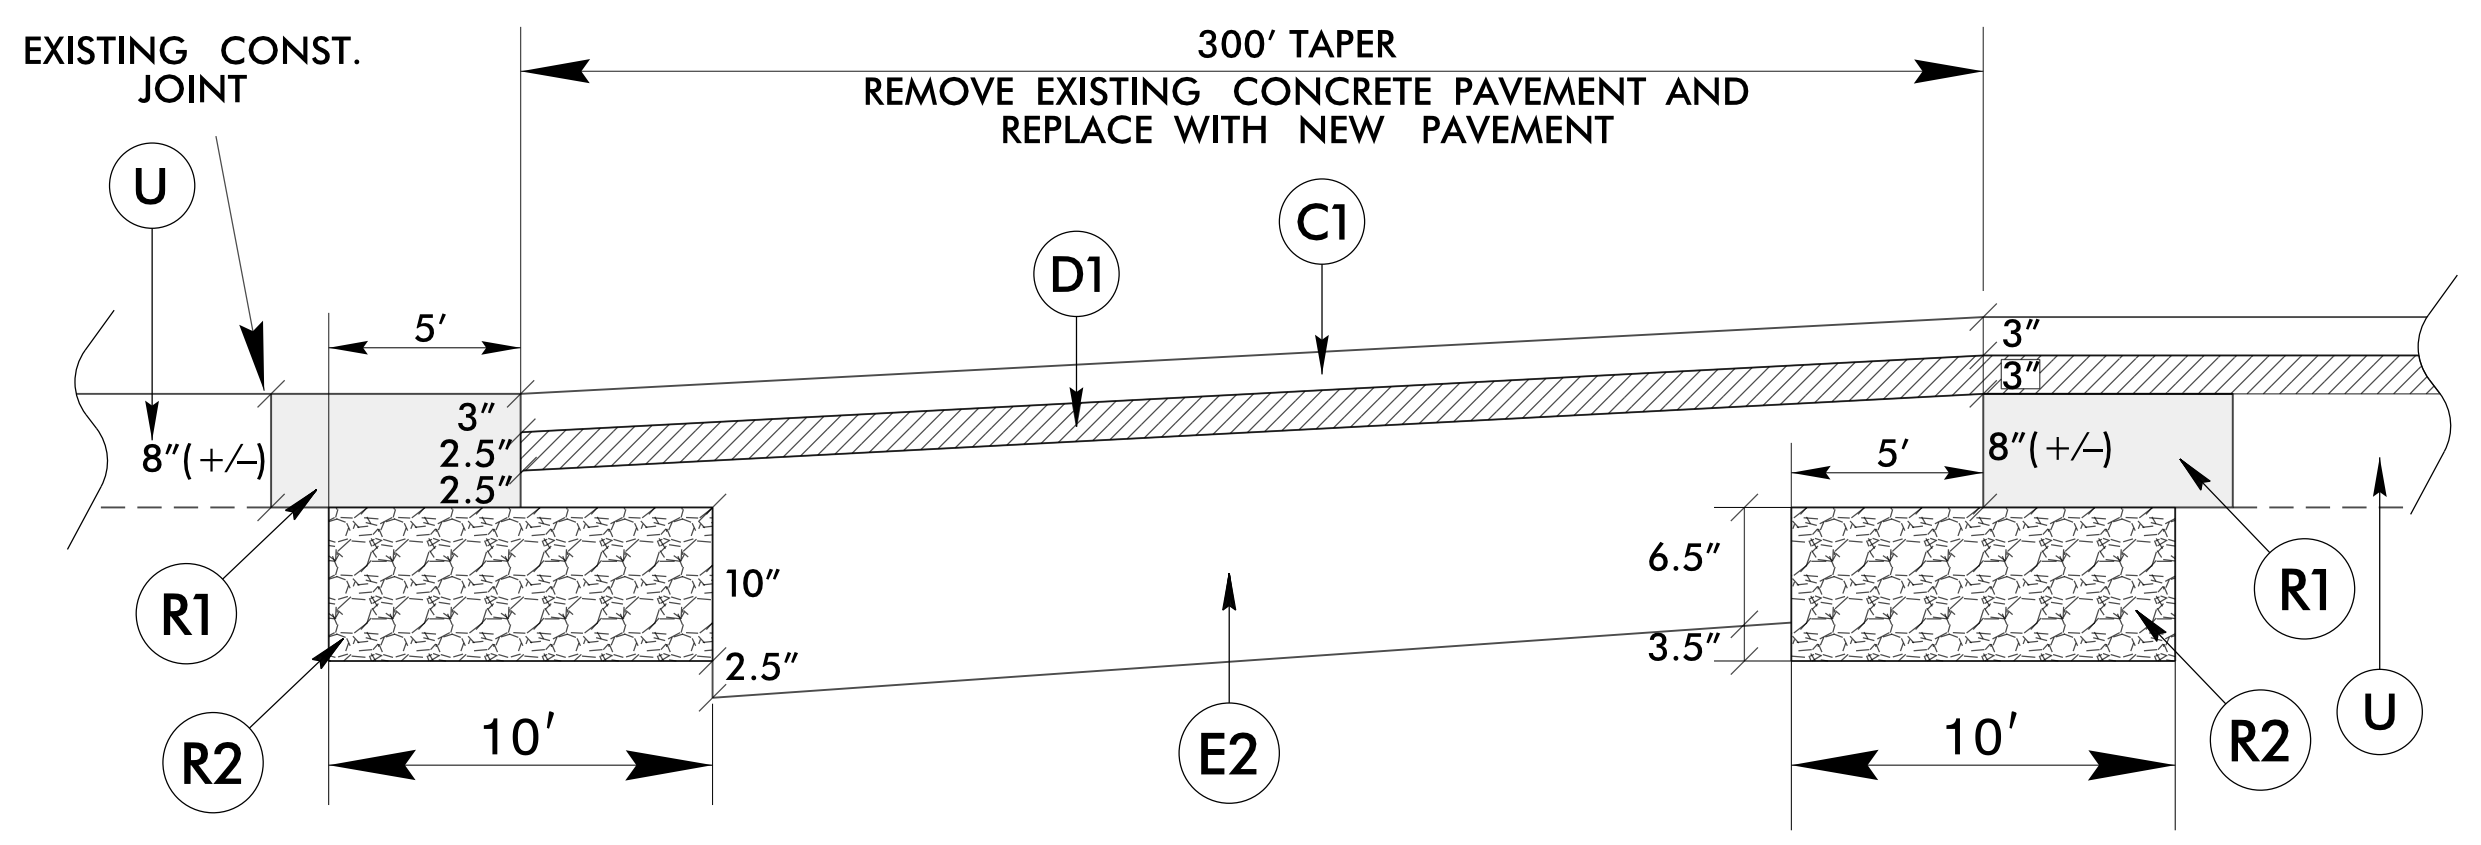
DETAIL SHOWING SHOULDER SHALLOW UNDERCUT
